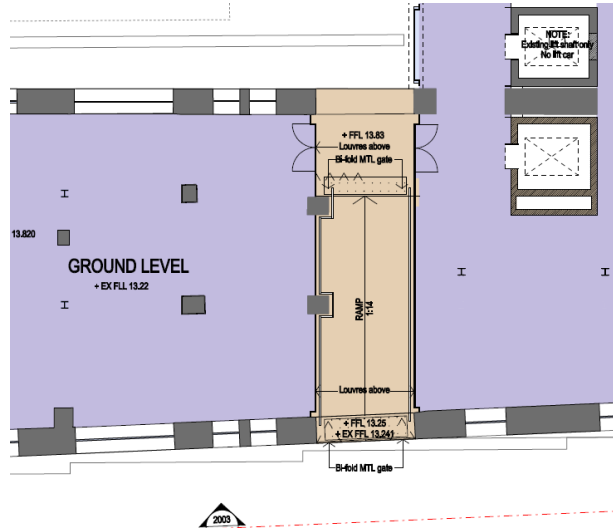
Proposed ground Floor entry to Building 23 through former cart drive
